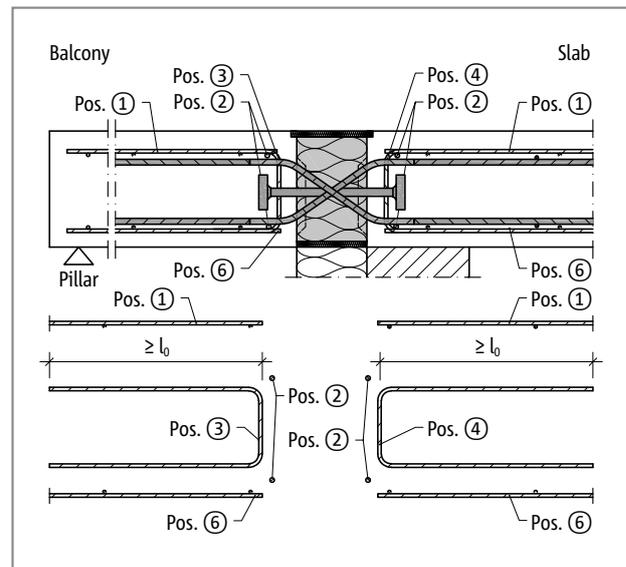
Schöck Isokorb® XT type Q-P-VV: On-site reinforcement
